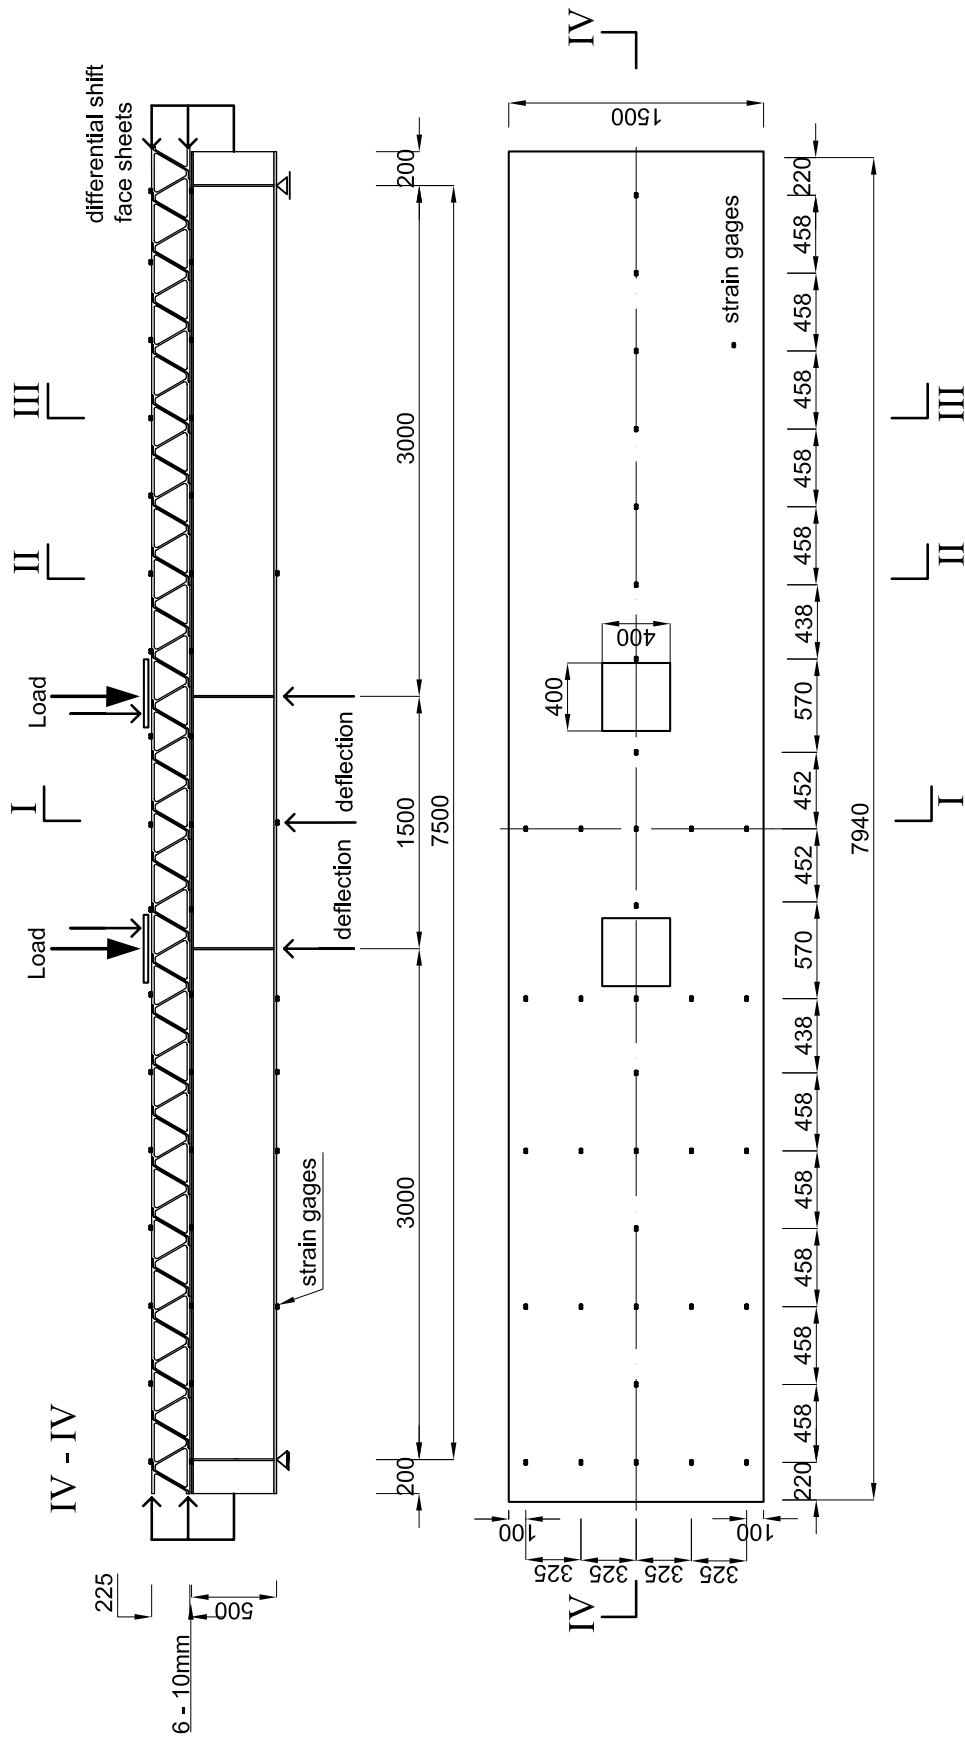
Set-up, elevation and top view of ASSET girder.
